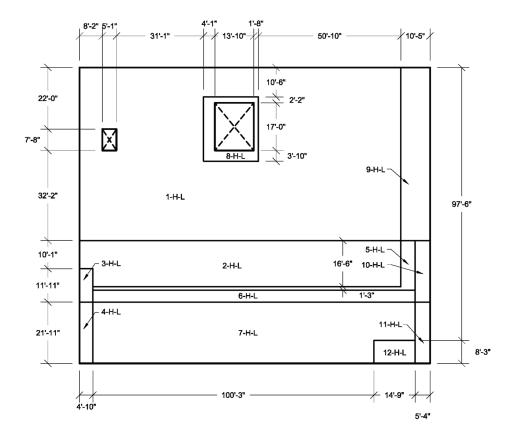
H.3-18 East Wall Looking West Horizontal Reinforcement Zones Near Side Face
